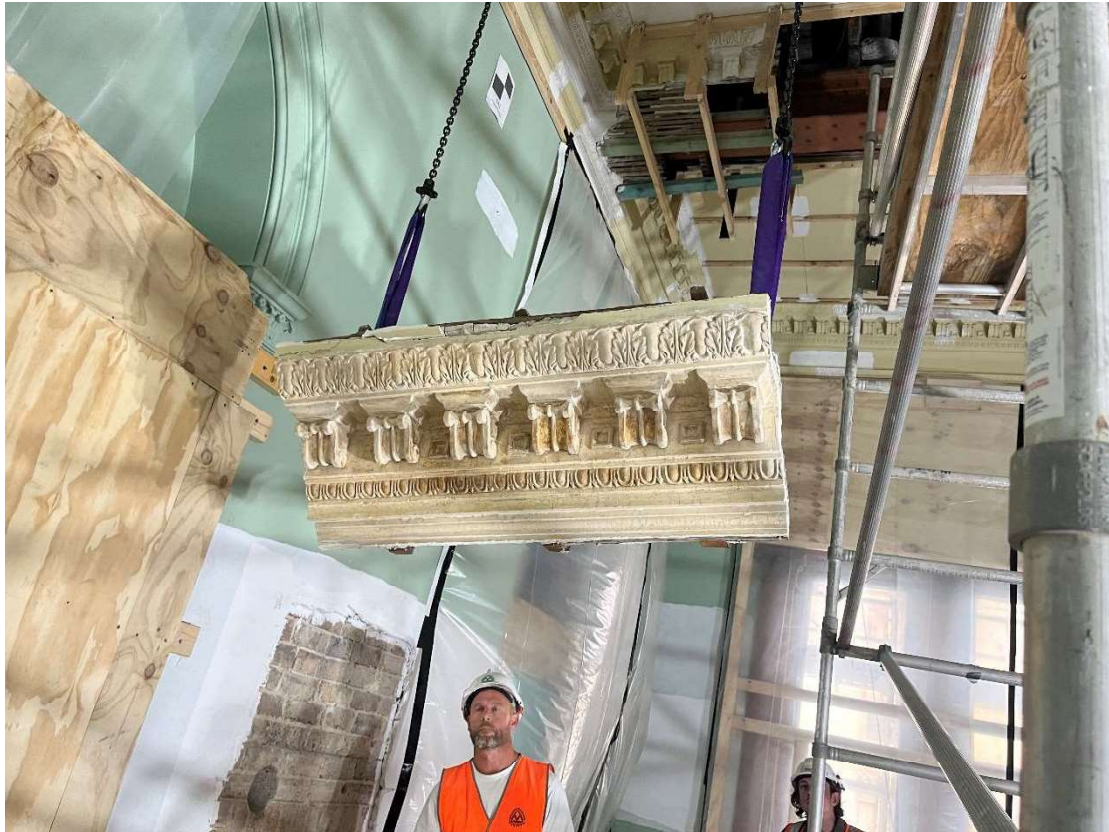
Salvaged Cornice from Beams being lowered to the floor below
